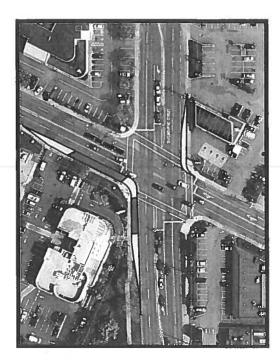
Concept of Shelbourne Street at Cedar Hill X Road Pedestrian/Transit Improvements
